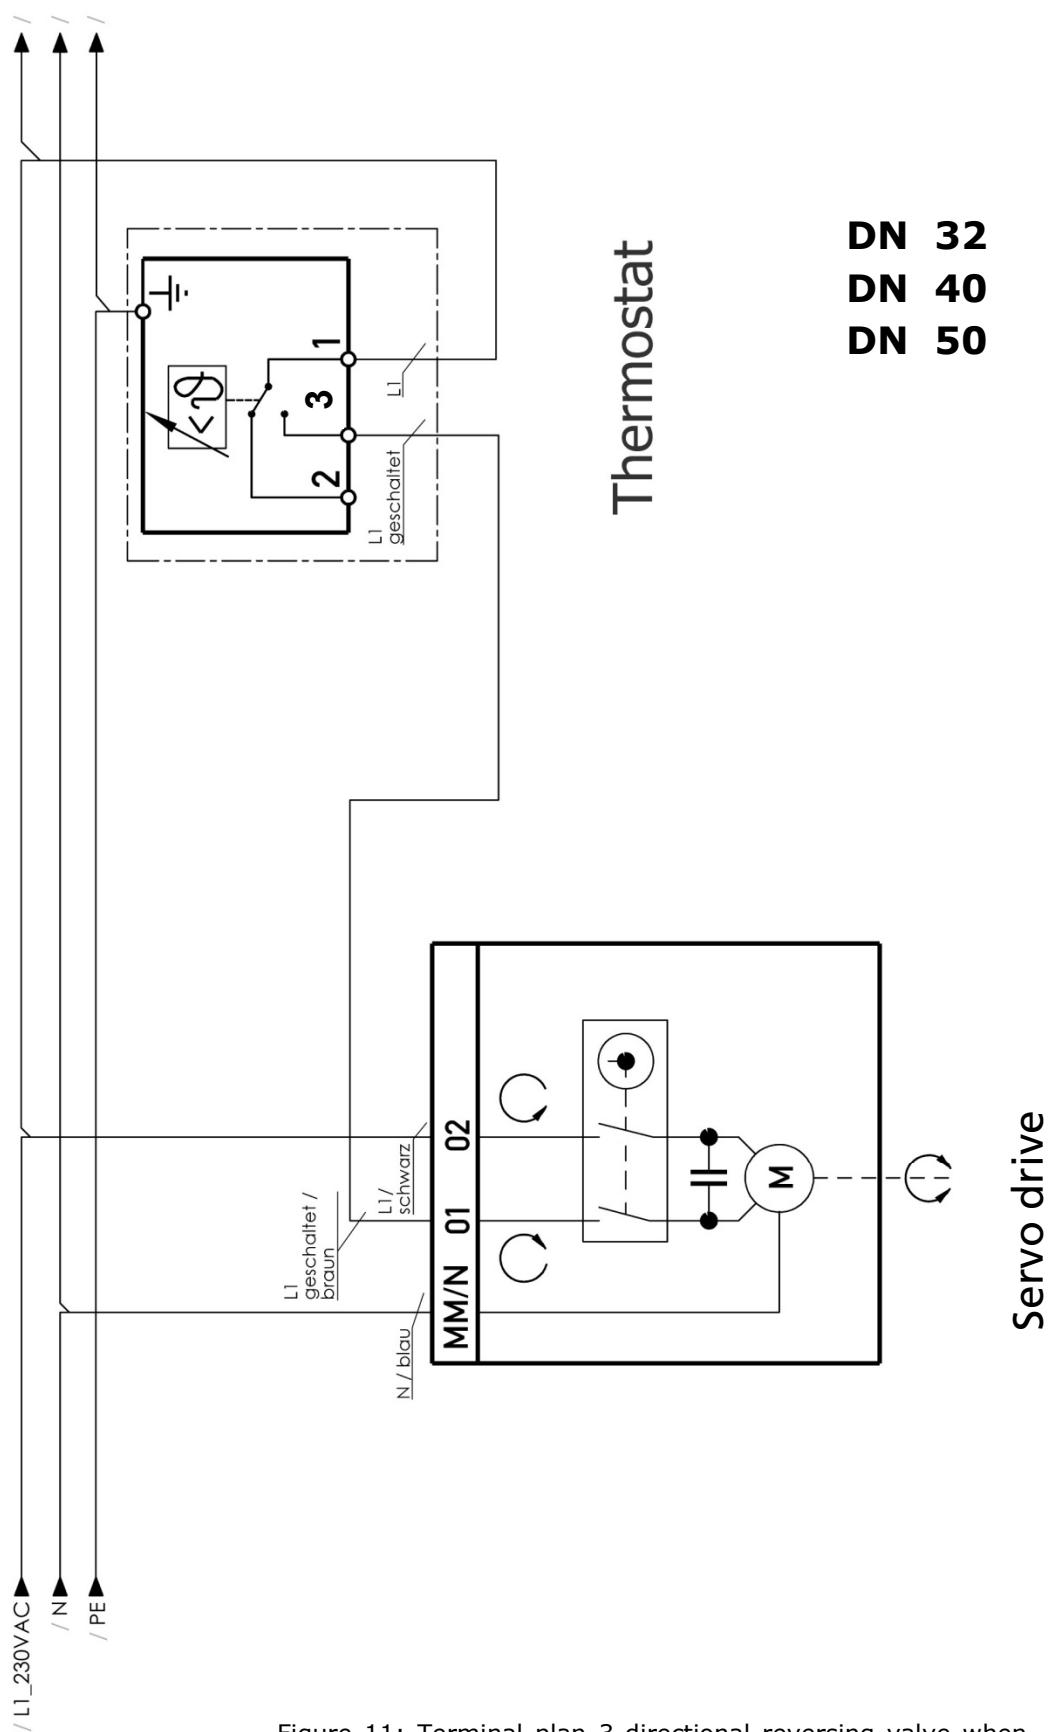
Terminal plan 3-directional reversing valve when the ThermoTank is connected to the left
